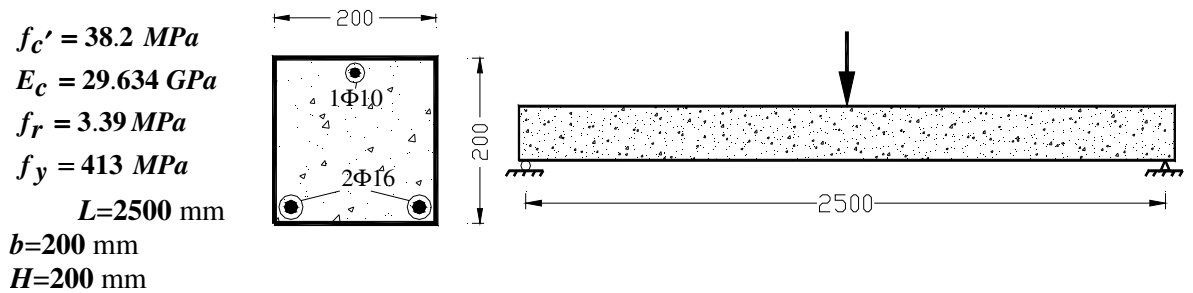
Details of a reinforced concrete simply supported beam under concentrated load at mid span with $(L/H=12.5)$ (Al-Zaid, et al.)
